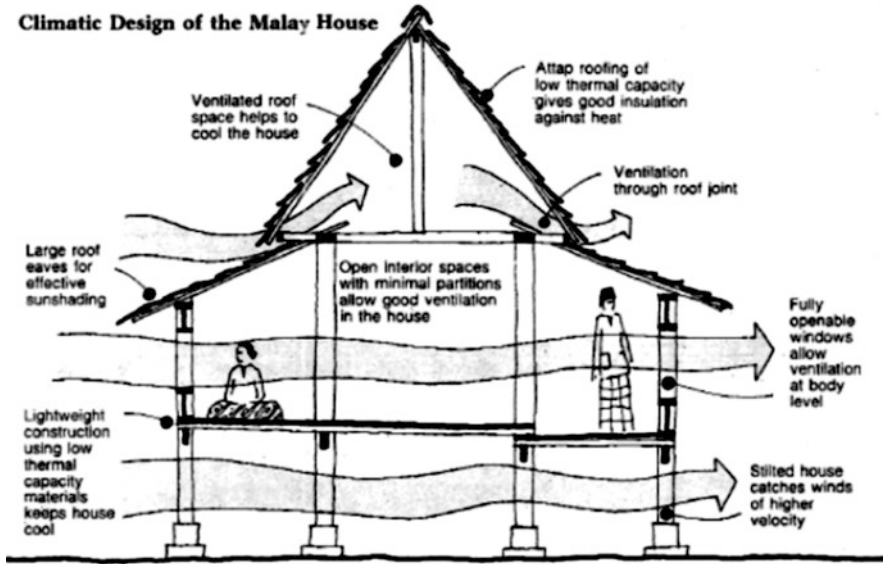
A cross section of a typical Malay Vernacular House (Lim 1987)
